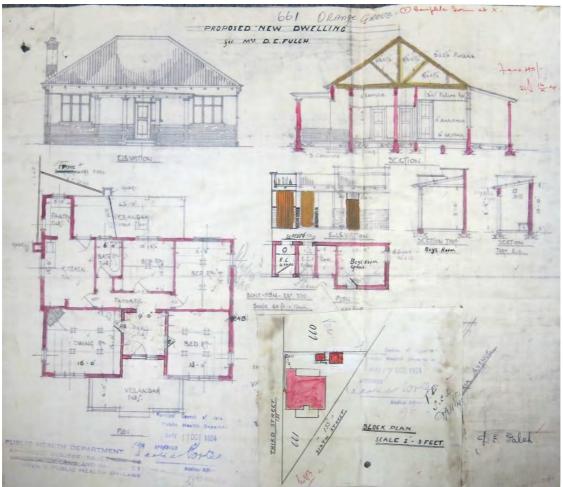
Plan for proposed new dwelling on Stand 661, Orange Grove from 1924 Good example of building typology of the 1920's which can be found all over Johannesburg's suburbs
